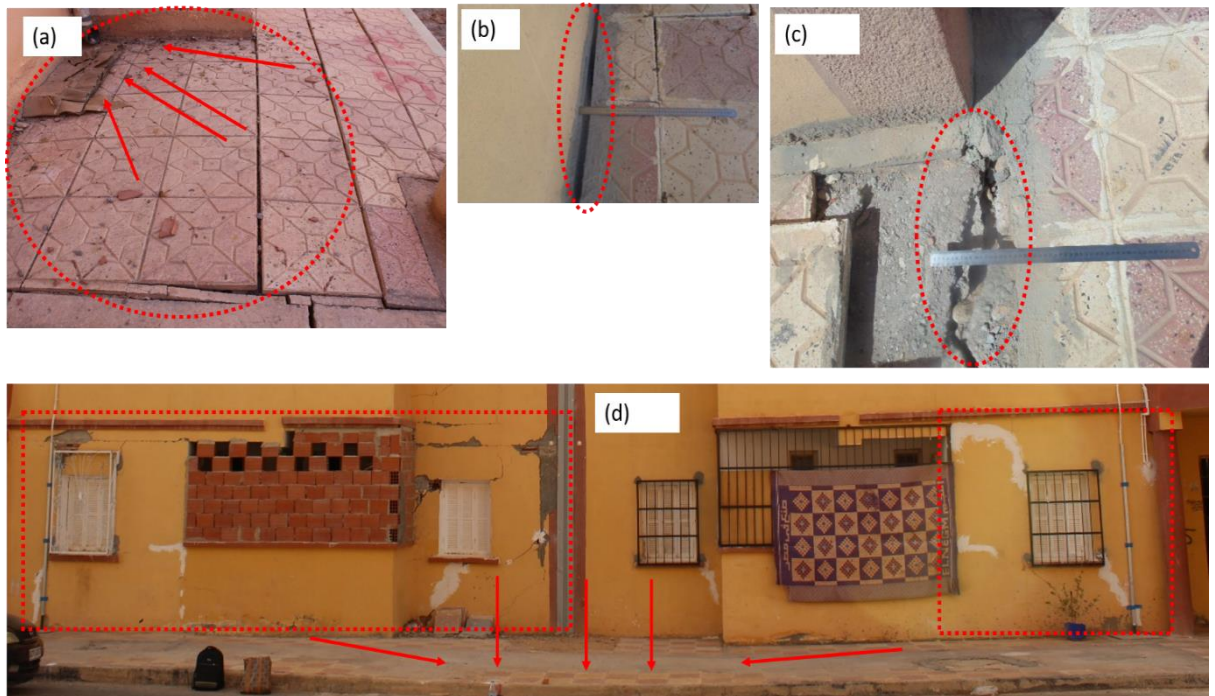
Signs of settlement in the building foundations and subsidence: (a) Settlement in the foundation and cracking of the surrounding pavement, (b) Voids between the building and its pavement that are supposed to be associated with ground sliding resulting from the excessive settlement of adjacent foundation, (c) Significant cracking that crosses the tile layer until the soil (d) Subsidence parallel to intensive cracks on the building facade.
